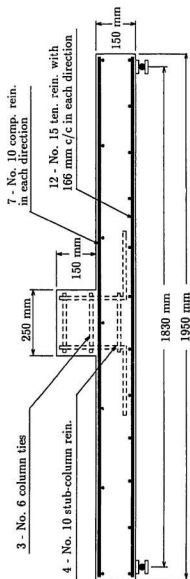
Dimension and reinforcement details of a reference slab (HS17)
